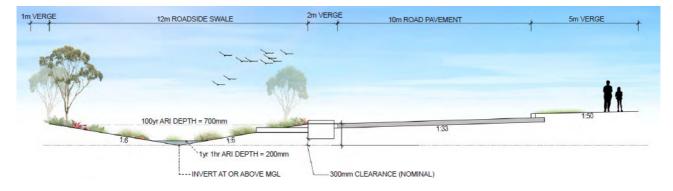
Nominal 30m Road Cross-Section for Coldwell Road and Grove Road
